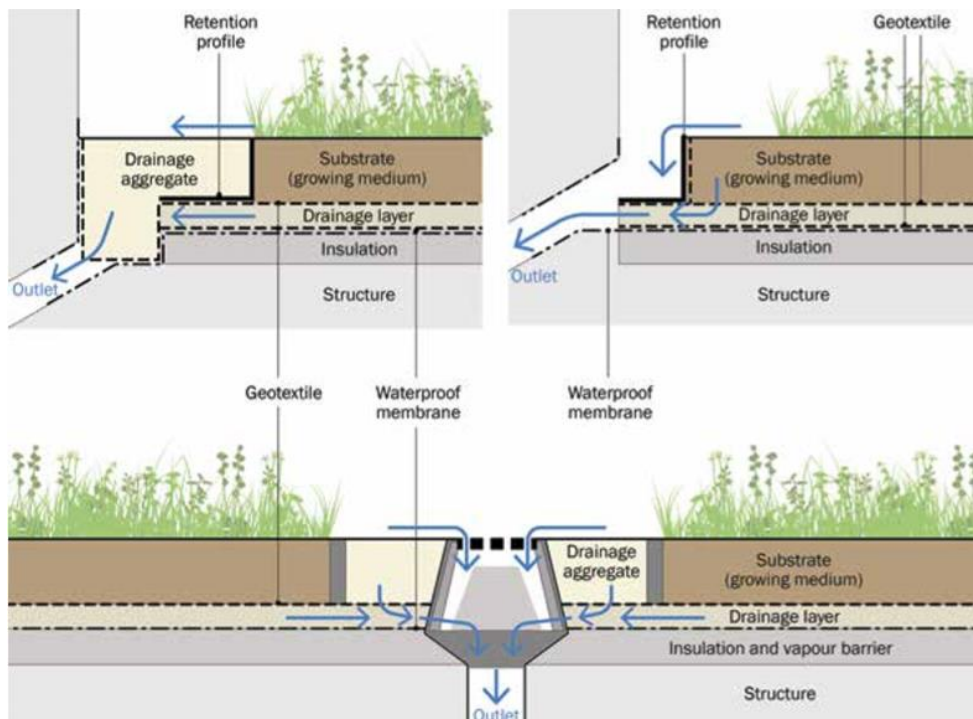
Example Details of outlets from a green roof (CIRIA C697)
